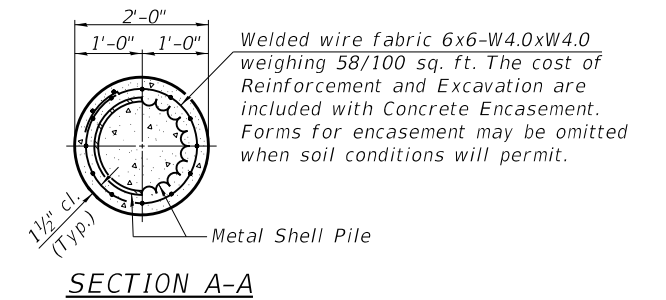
DETAIL OF CYLINDRICAL STEEL SHELL FOR CAST IN PLACE CONCRETE PILES
